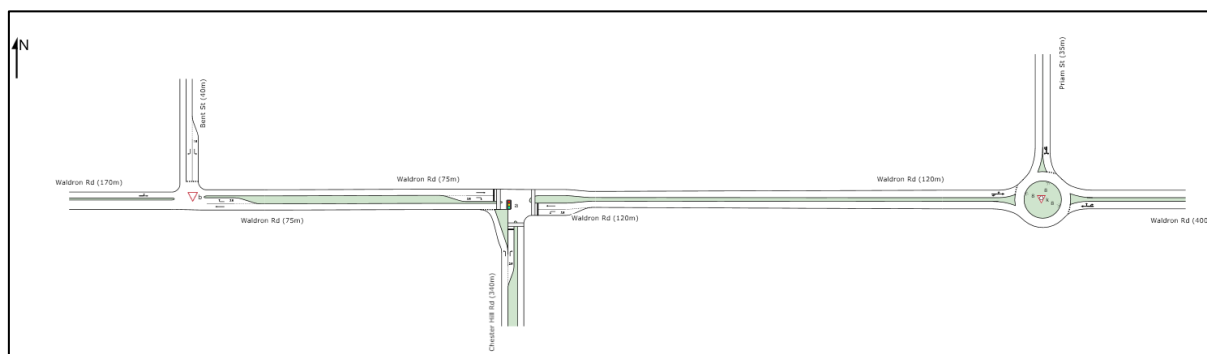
Waldron Road - SIDRA Modelling Intersection Layouts (Existing)
